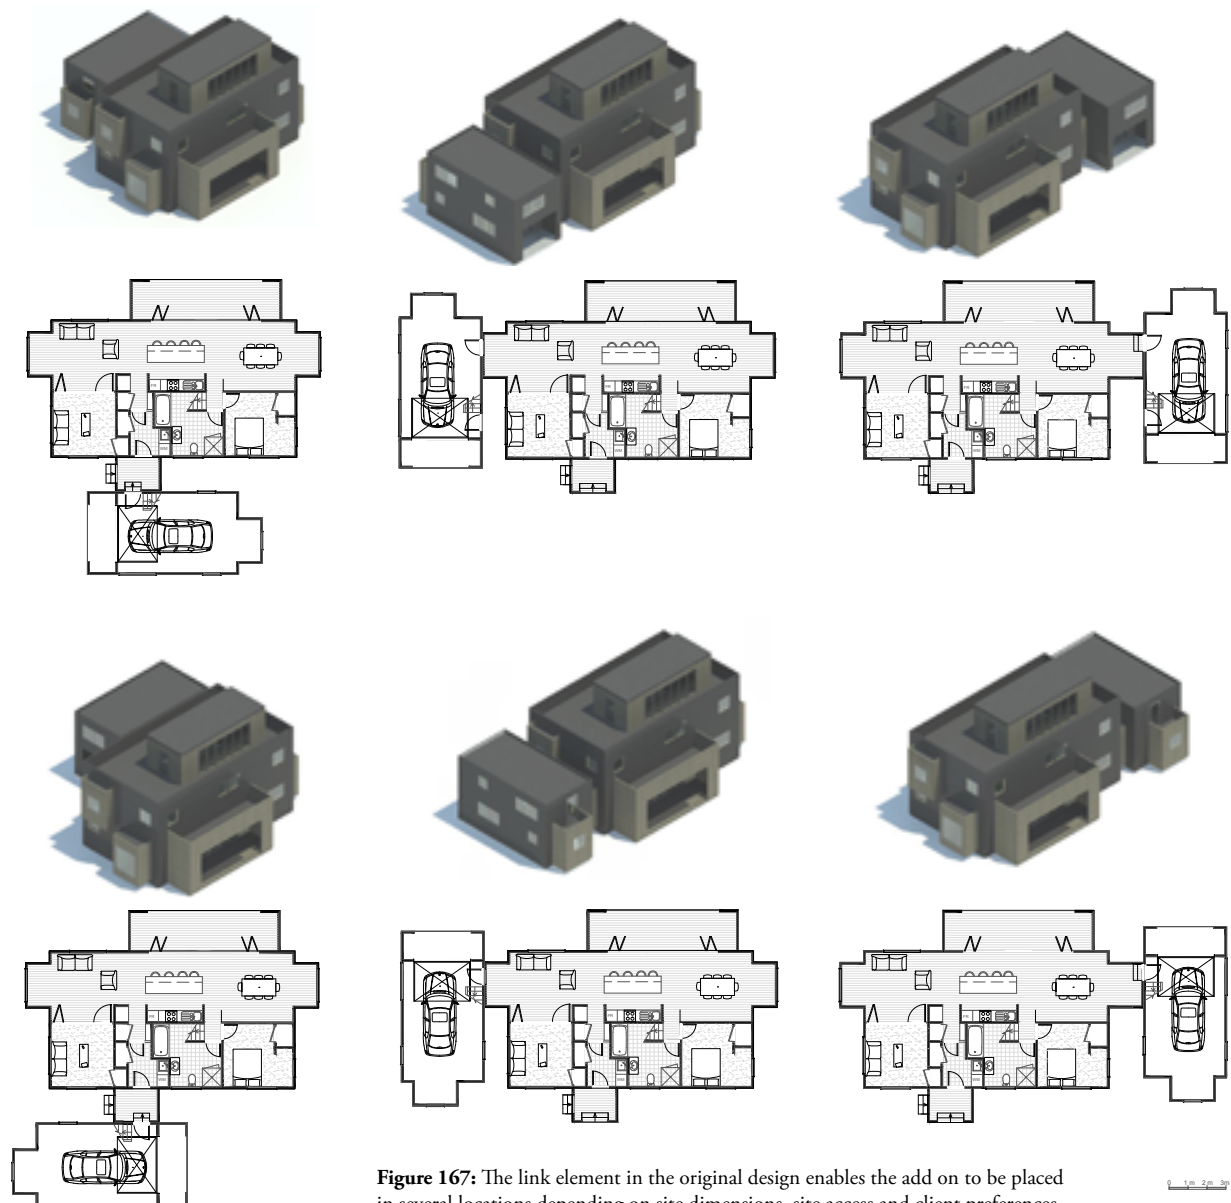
The link element in the original design enables the add on to be placed in several locations depending on site dimensions, site access and client preferences.
